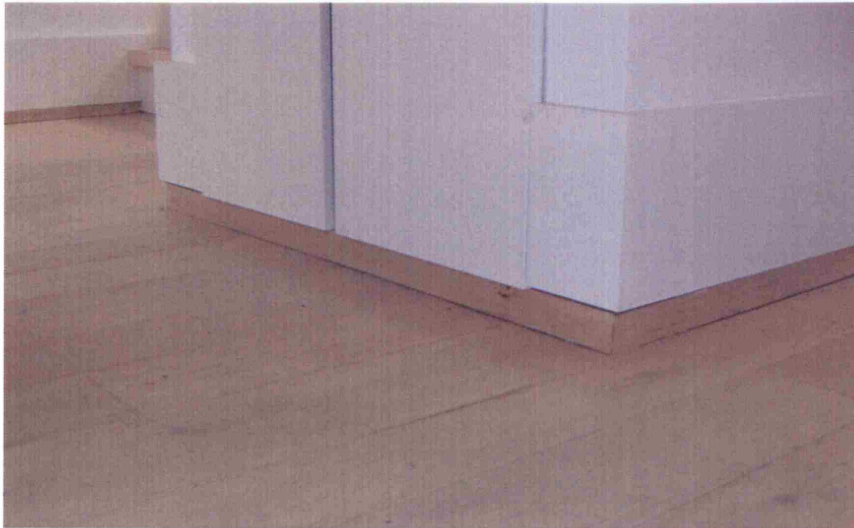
Ivana Wingham, *Homely Rhythms* – floor/wall detail, photograph, London, 2004-2005.
